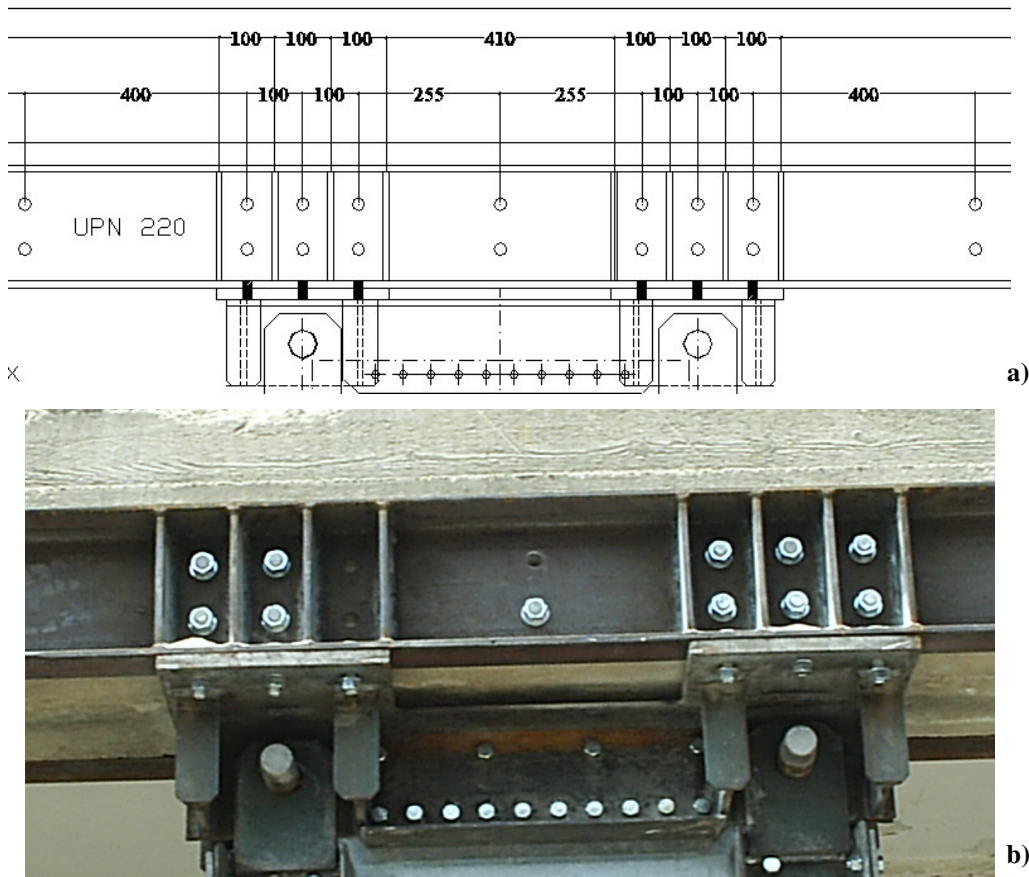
Shear wall – steel beam connection: design (a) and realization of the intervention (b)
